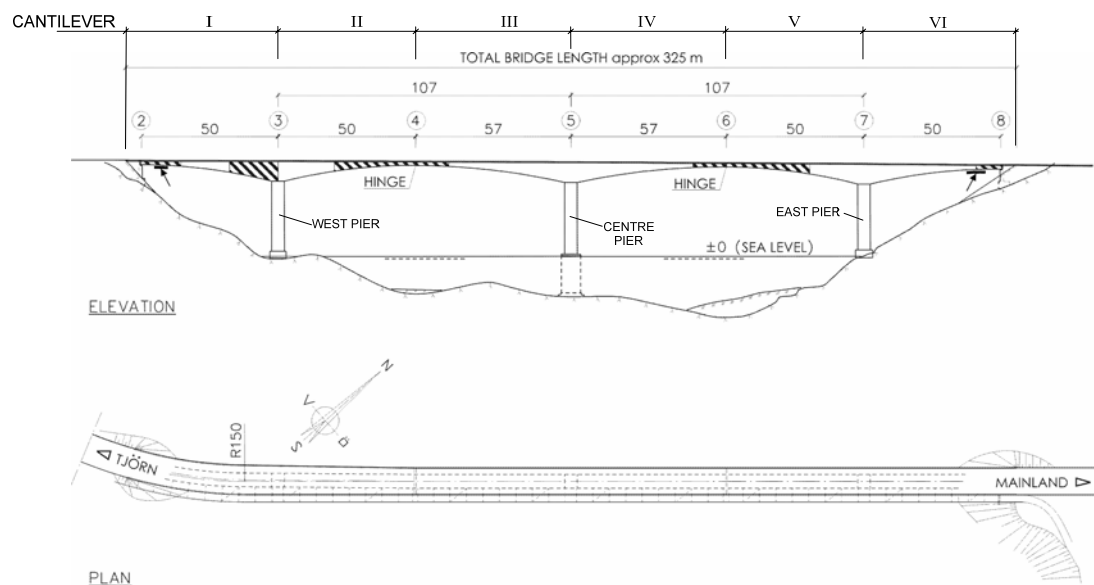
Elevation and plan of the Källösund Bridge. Modified from Enochsson *et al.*⁹.
